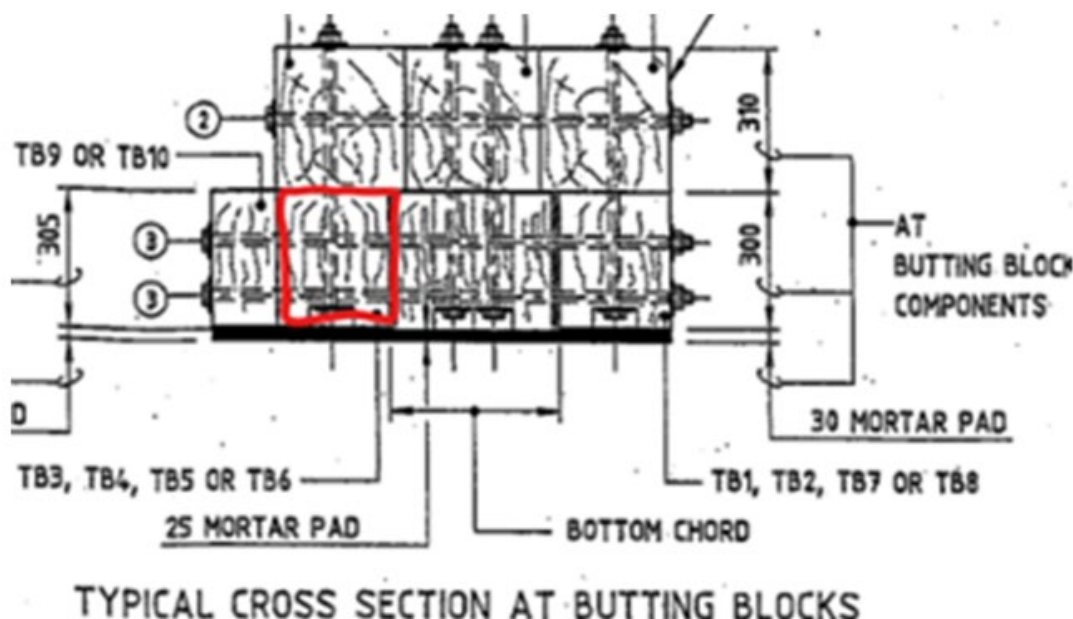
Butting block section. (Source: Design Report, Aurecon 2023)
